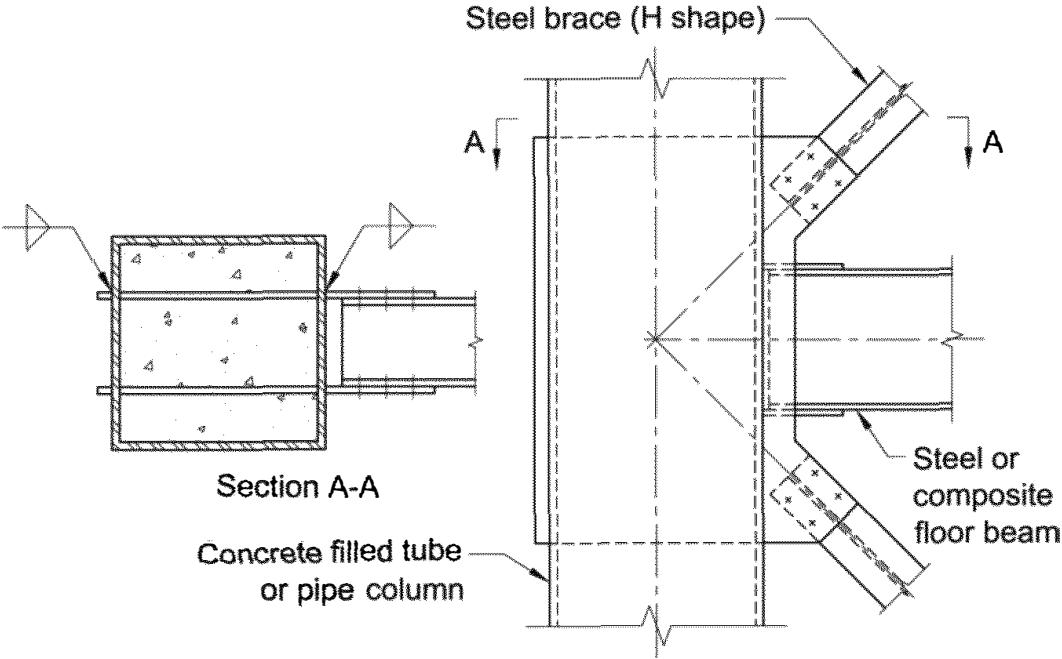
Filled HSS or pipe column-to-steel concentric base.
